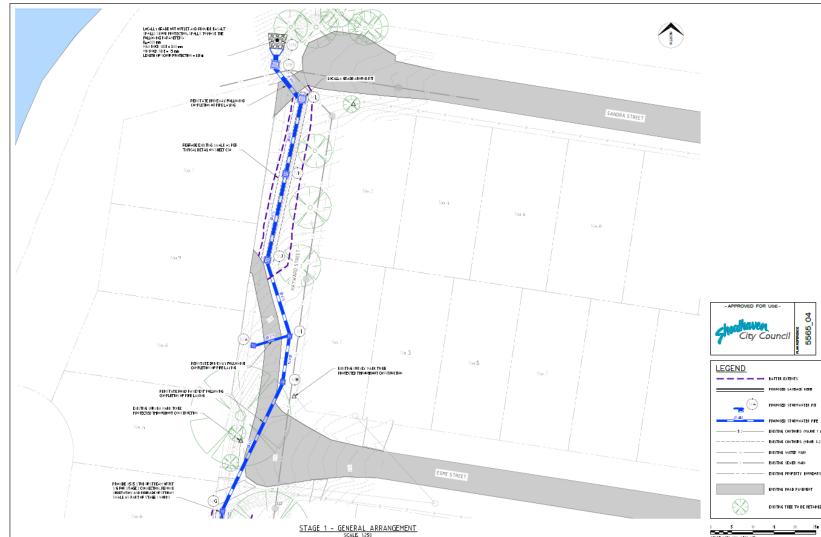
Extract of Plans (refer to Appendix A for full set of plans)
